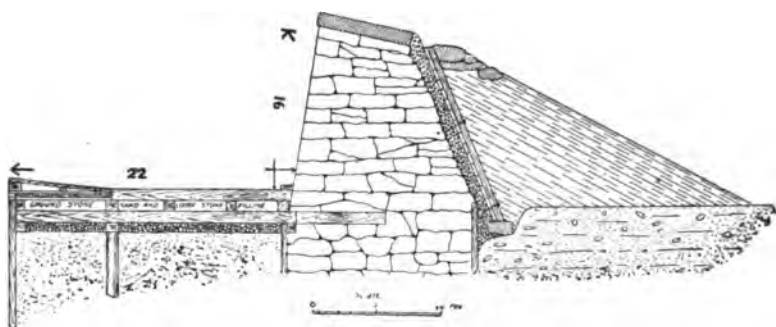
Cross-section of Norwich Water Power Company's Weir.
